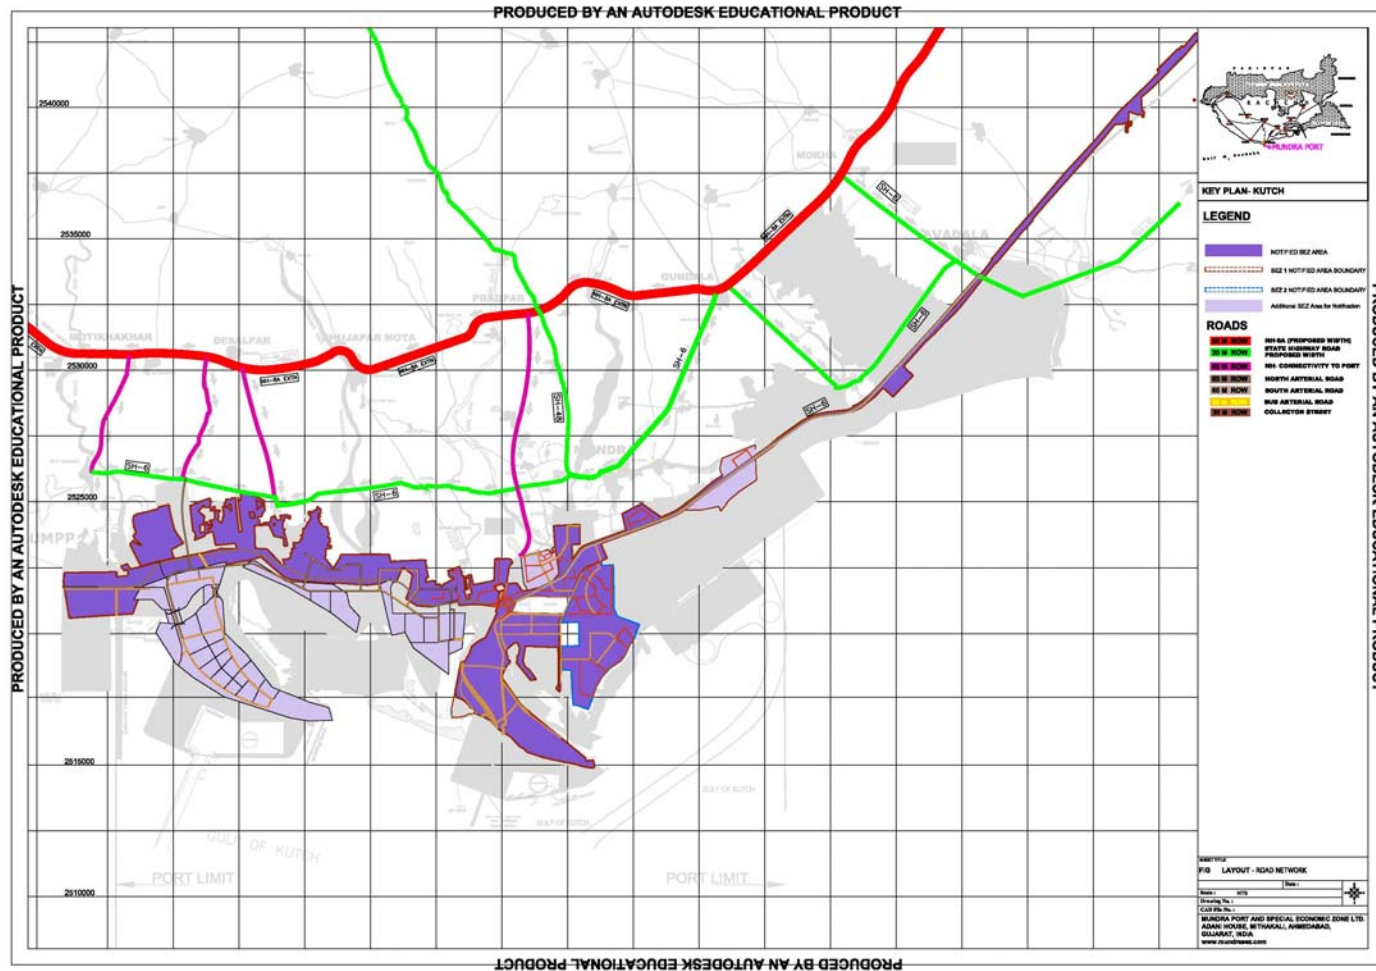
Road Connectivity & Road Network in Mundra SEZ
